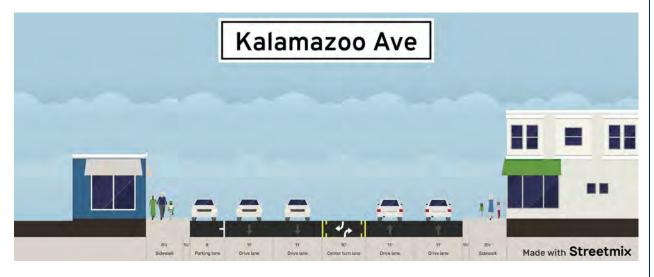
Proposed Cross Section of Alternative #3 for Kalamazoo Ave
